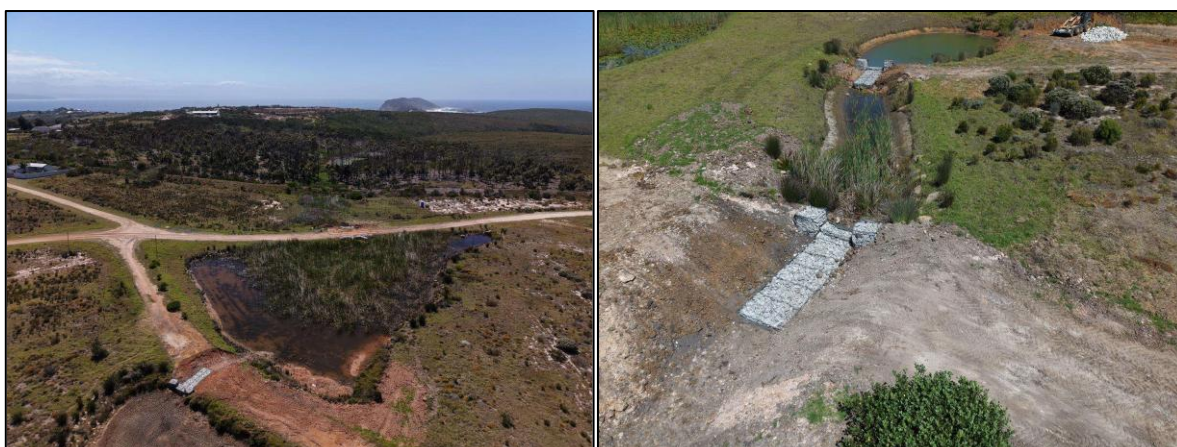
Photographs showing dam walls excavated out with gabion flow energy dissipation structures.
